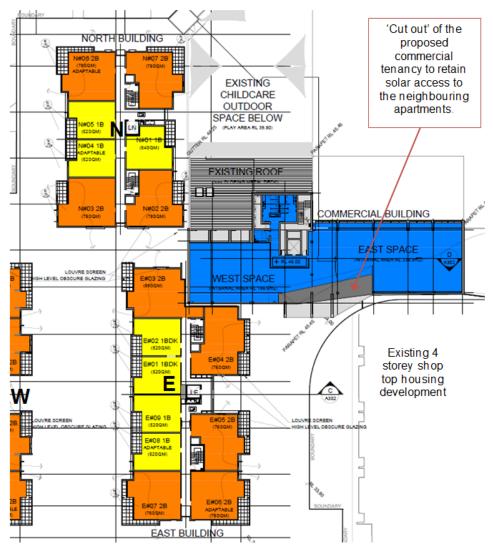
Extract from the applicant's Level 2 and 3 Plan demonstrating the location of the proposed commercial tenancy to be constructed above the existing building (shown in blue) and the location of the proposed residential apartments on Levels 2 and 3.
